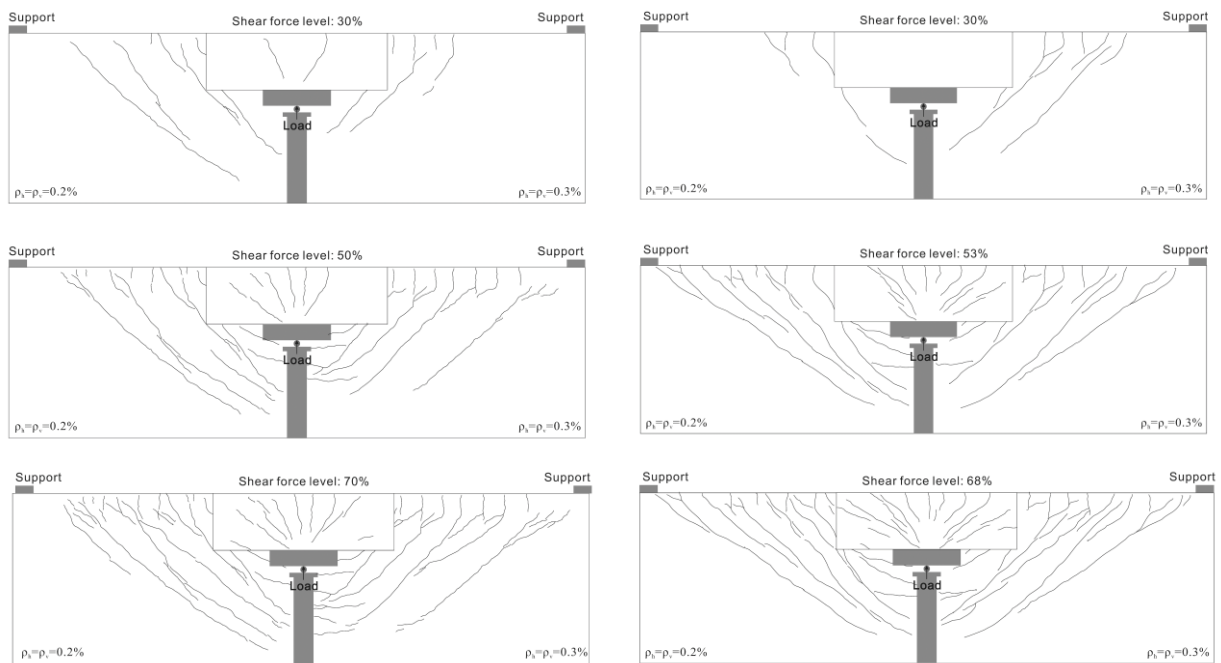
illustrates the crack patterns observed in inverted T deep beams. Initially, flexural cracks formed near the ledge on the tension side of the rectangular section. Subsequently, diagonal cracks developed at the tips of the flexural cracks, extending toward the middle of the ledge and the compression side of the beam. Following this, additional diagonal cracks developed parallel to the initial cracks, forming between the support and the ledge. Cracks were also appeared on the side surface of the ledge. Near failure, crack patterns and failure modes distinct from those observed in the rectangular deep beams. First, the initially developed diagonal cracks extended the lower part of the ledge transversely. In the final stage, a complex crack pattern emerged. Cracks formed at the edge between the ledge and rectangular sections and diagonal cracks propagating
